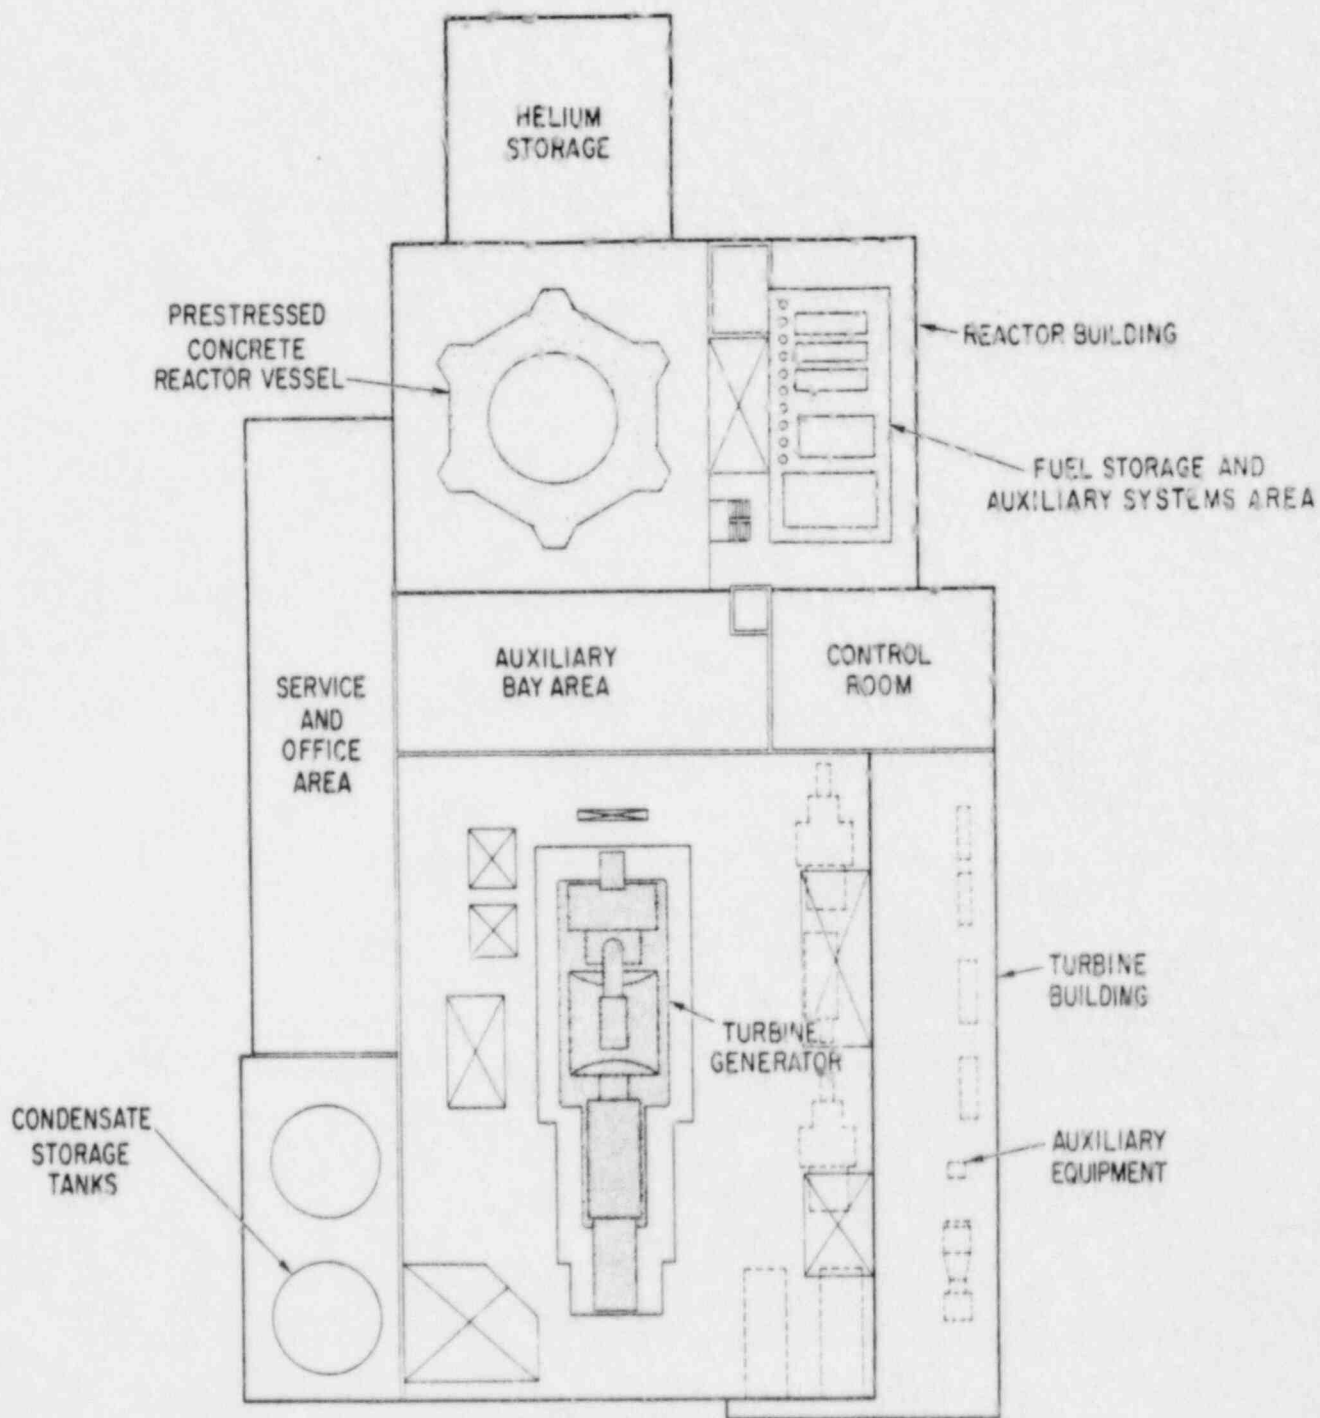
Plan View of Reactor Building and Turbine Building
